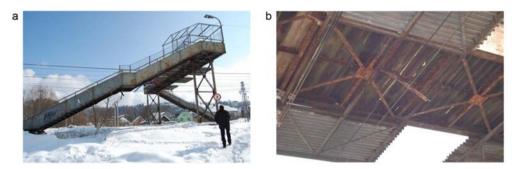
(a) view of the footbridge #2; (b) corrosion of deck members and damaged horizontal bracing.
